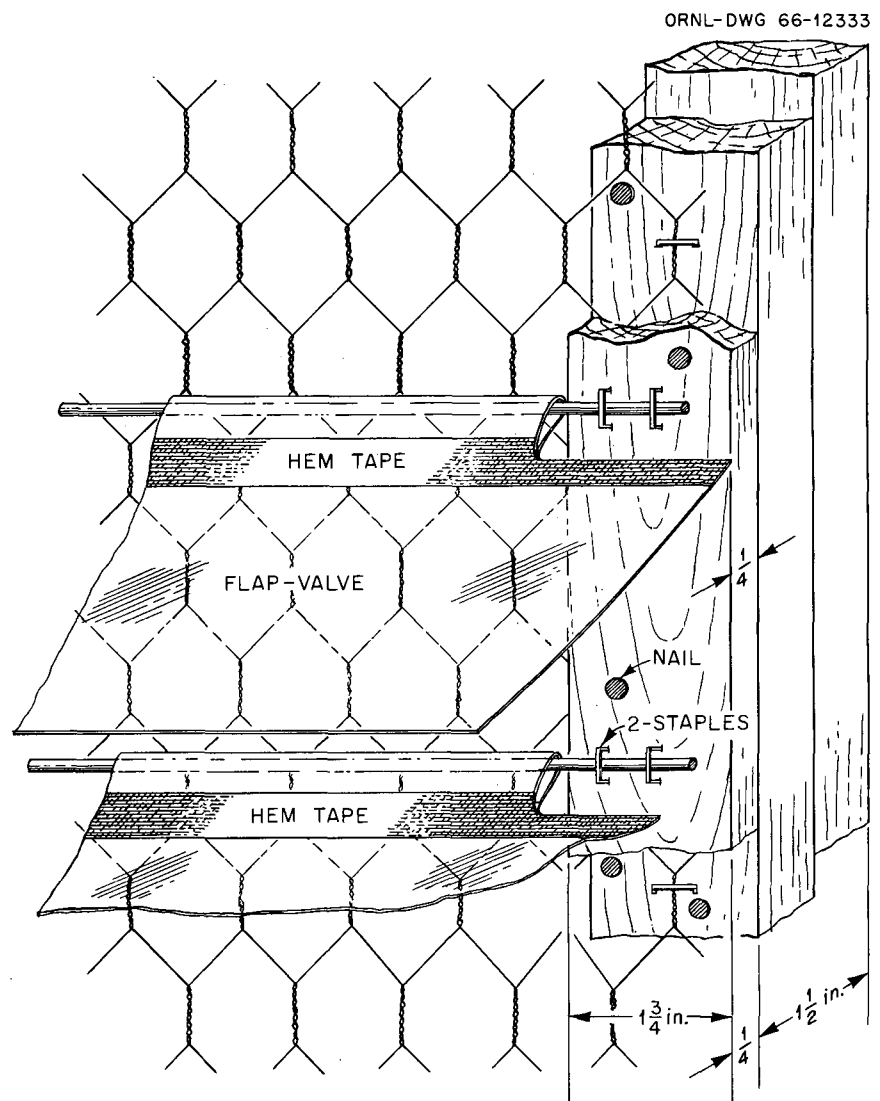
Chicken Wire Used as "Stops" for Flap-Valves
